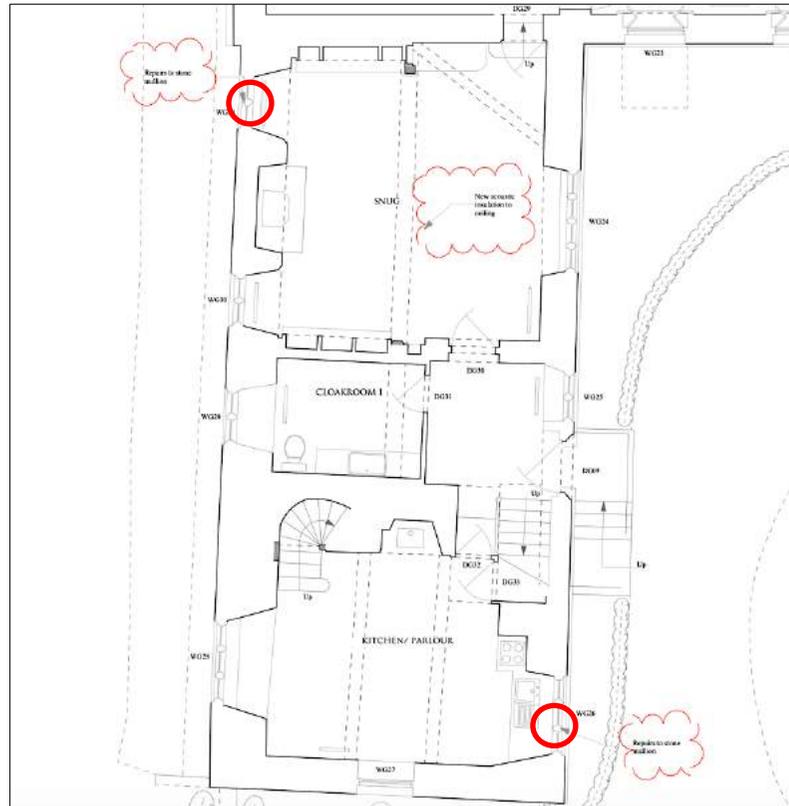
South-west wing, ground-floor plan; location of mullions for repair/replacement.
